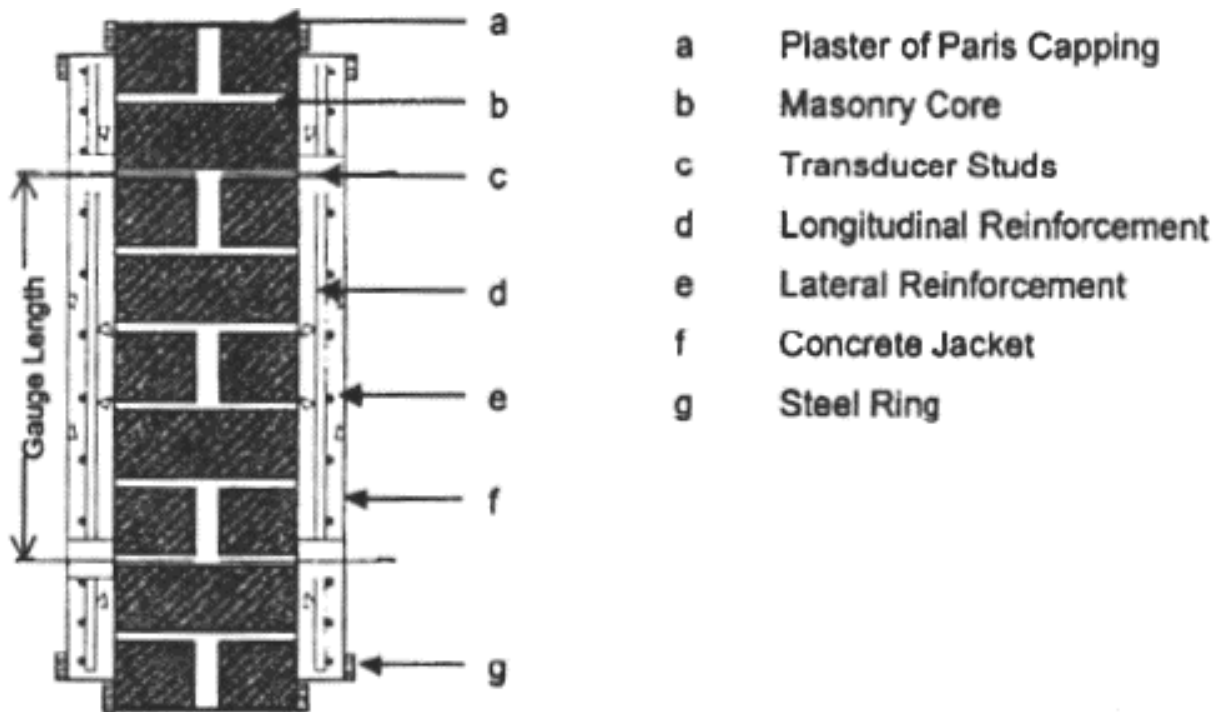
Typical concrete jacketed for brick masonry columns (Kog et al., 2001).
